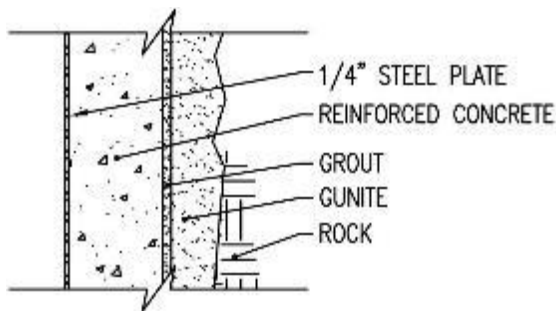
EXISTING BARREL CONFIGURATION
